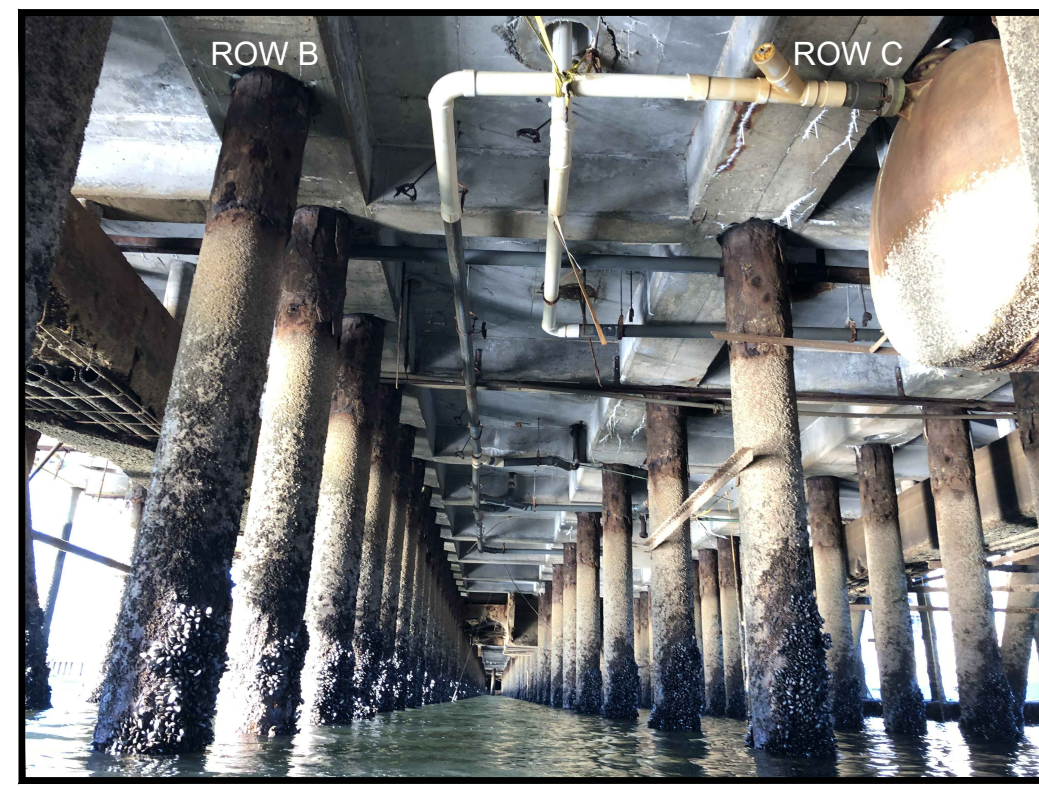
UNDERSIDE OF DECK LOOKING NORTH NEAR 53:B.5
